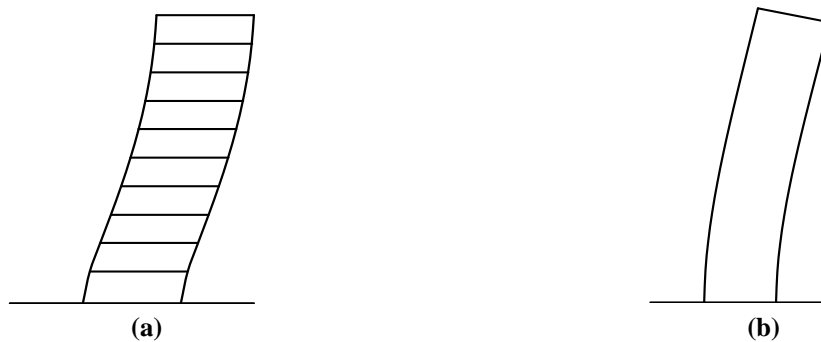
Building deformation profile; (a) frame, (b) wall
